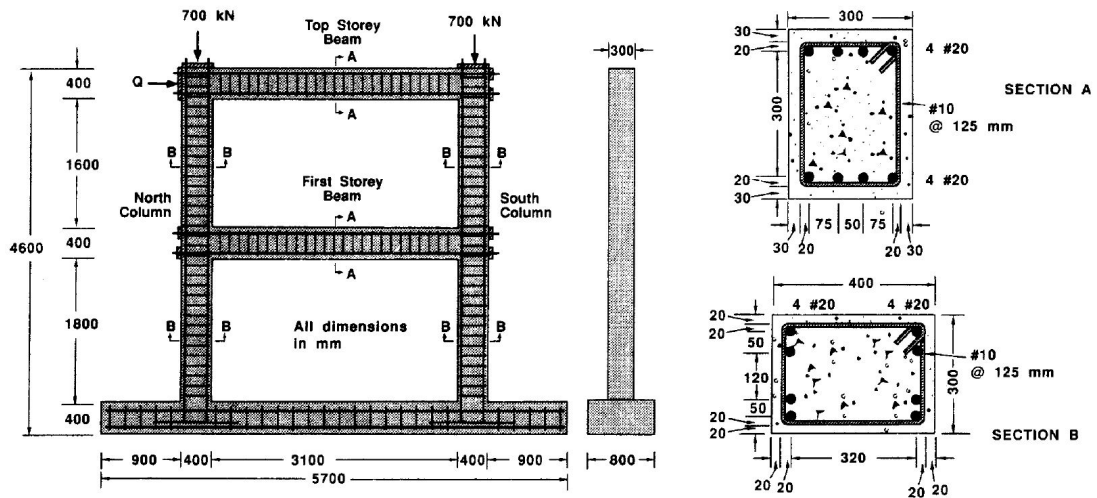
Two story RC frame: geometry and reinforcement details (Vecchio and Emará 1992).
